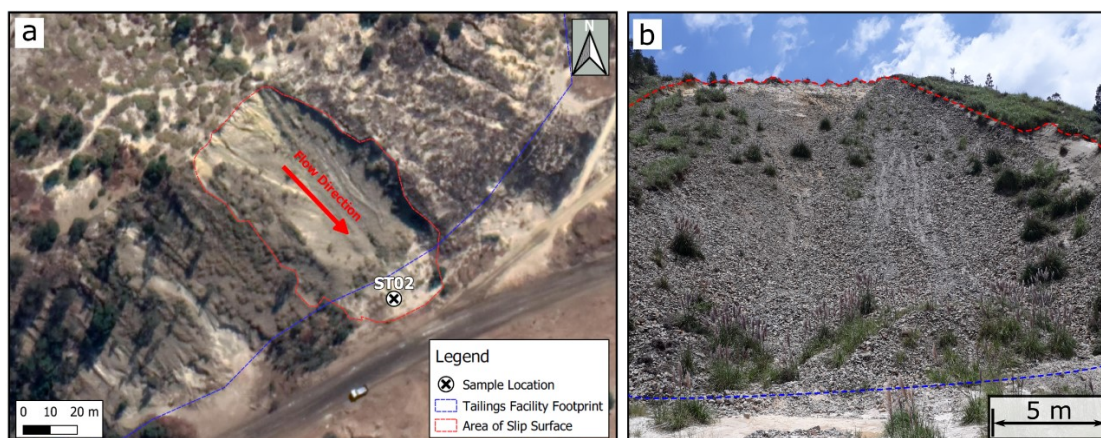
Sampling site 'ST02': a) Google Earth Imagery of Sample site and b) sampling site ST02, slip surface indicated
